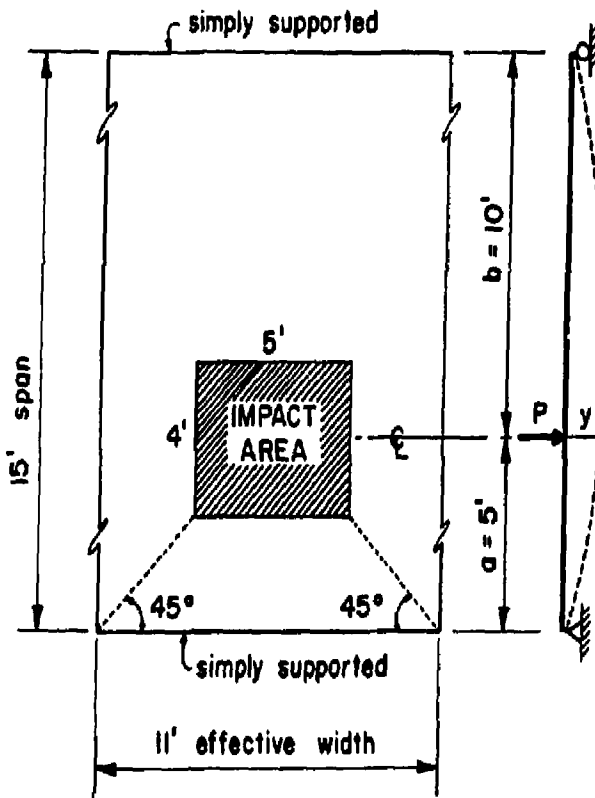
STRUCTURAL RESPONSE OF A REINFORCED CONCRETE WALL
